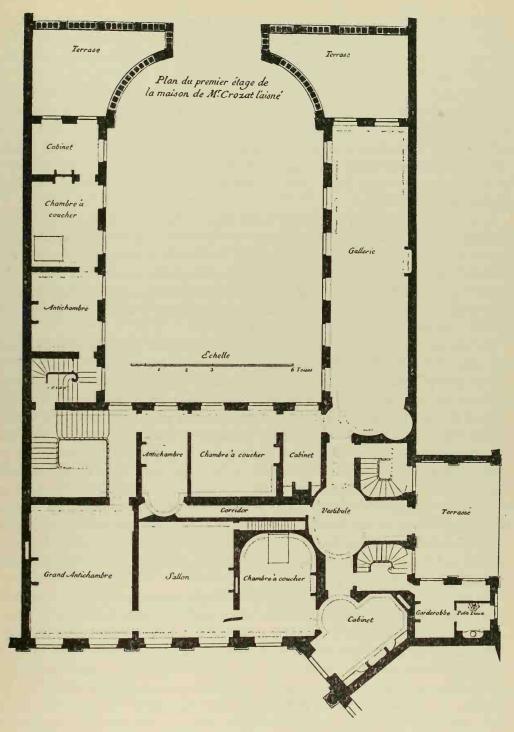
Bullet: Hôtel Crozat: Plan of first floor
